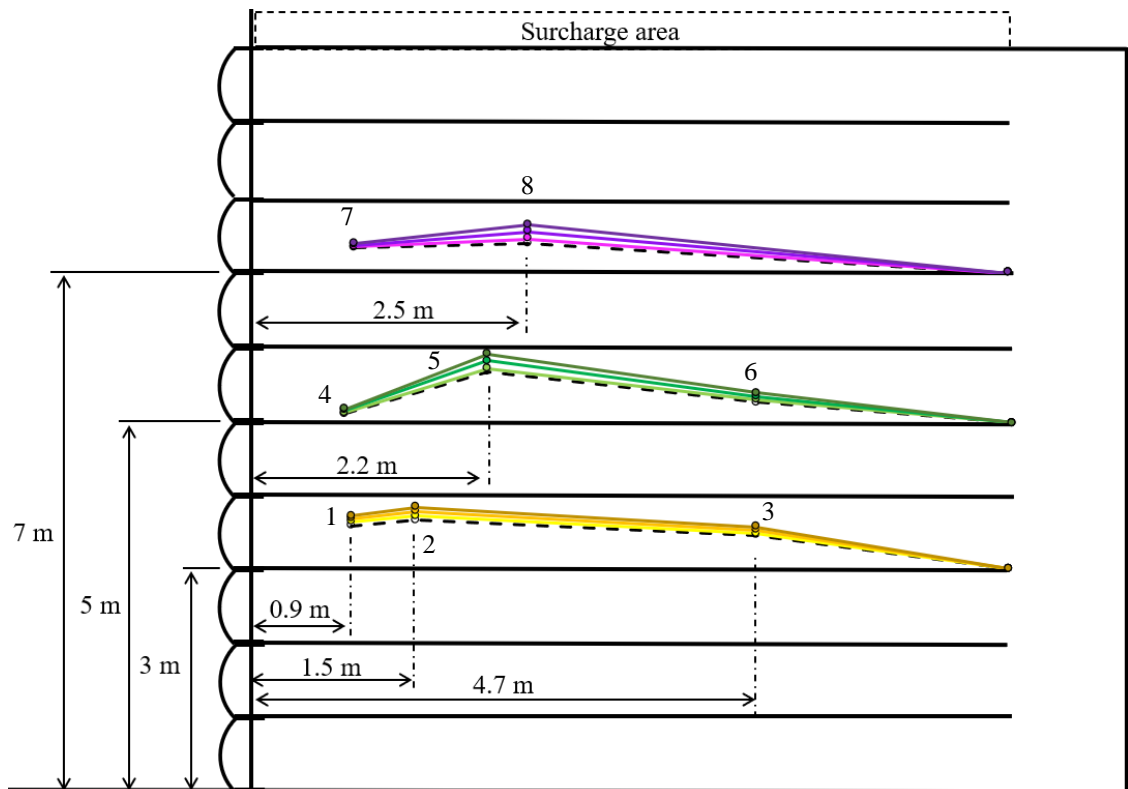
Representation of prototype soil wall cross-section with extensible reinforcement tensile force development under applied surcharge load.
